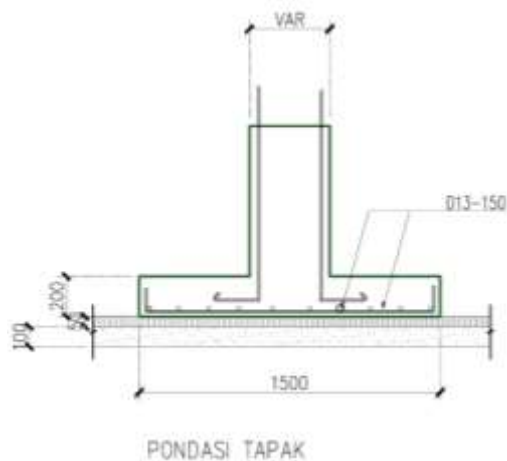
Type 1a Foundation: Square Foundation at A Depth of -2.20 M
